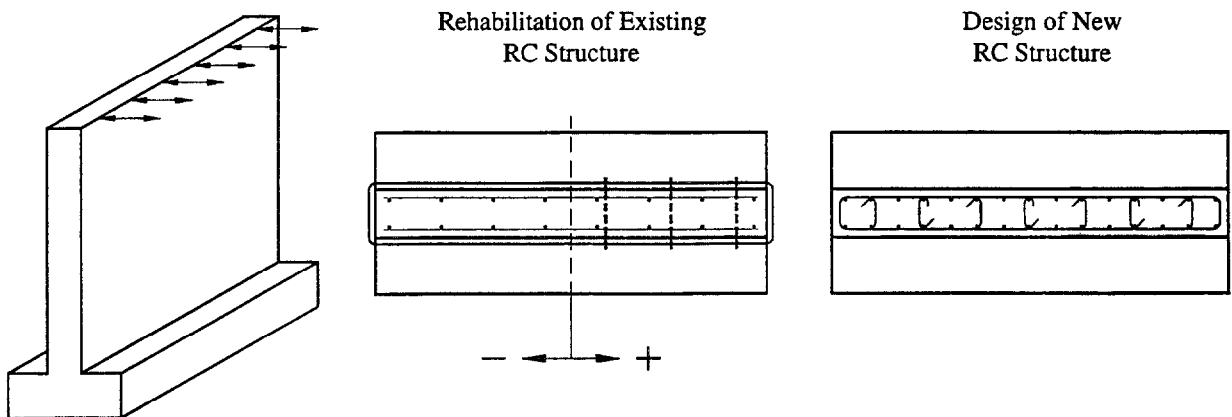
Design detailing for the seismic retrofit of rectangular columns/pier walls
